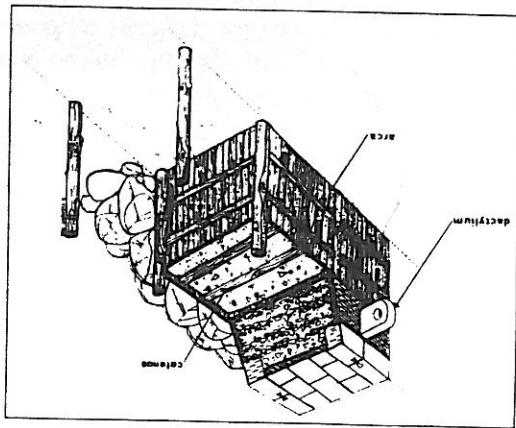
Reconstruction of the Roman construction system of a cast-in-situ concrete vertical breakwater (after Clementi, 1981¹⁸).
